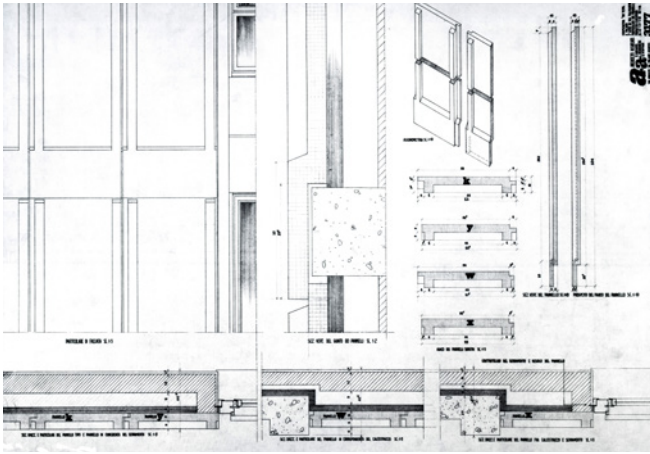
The building complex in via Palmanova, Milan, 1962–67. Detail drawing of the prefab panels. 1:2, 1:5, 1:20 scale. (CASVA, AA archive collection, drawing no. 3177).
